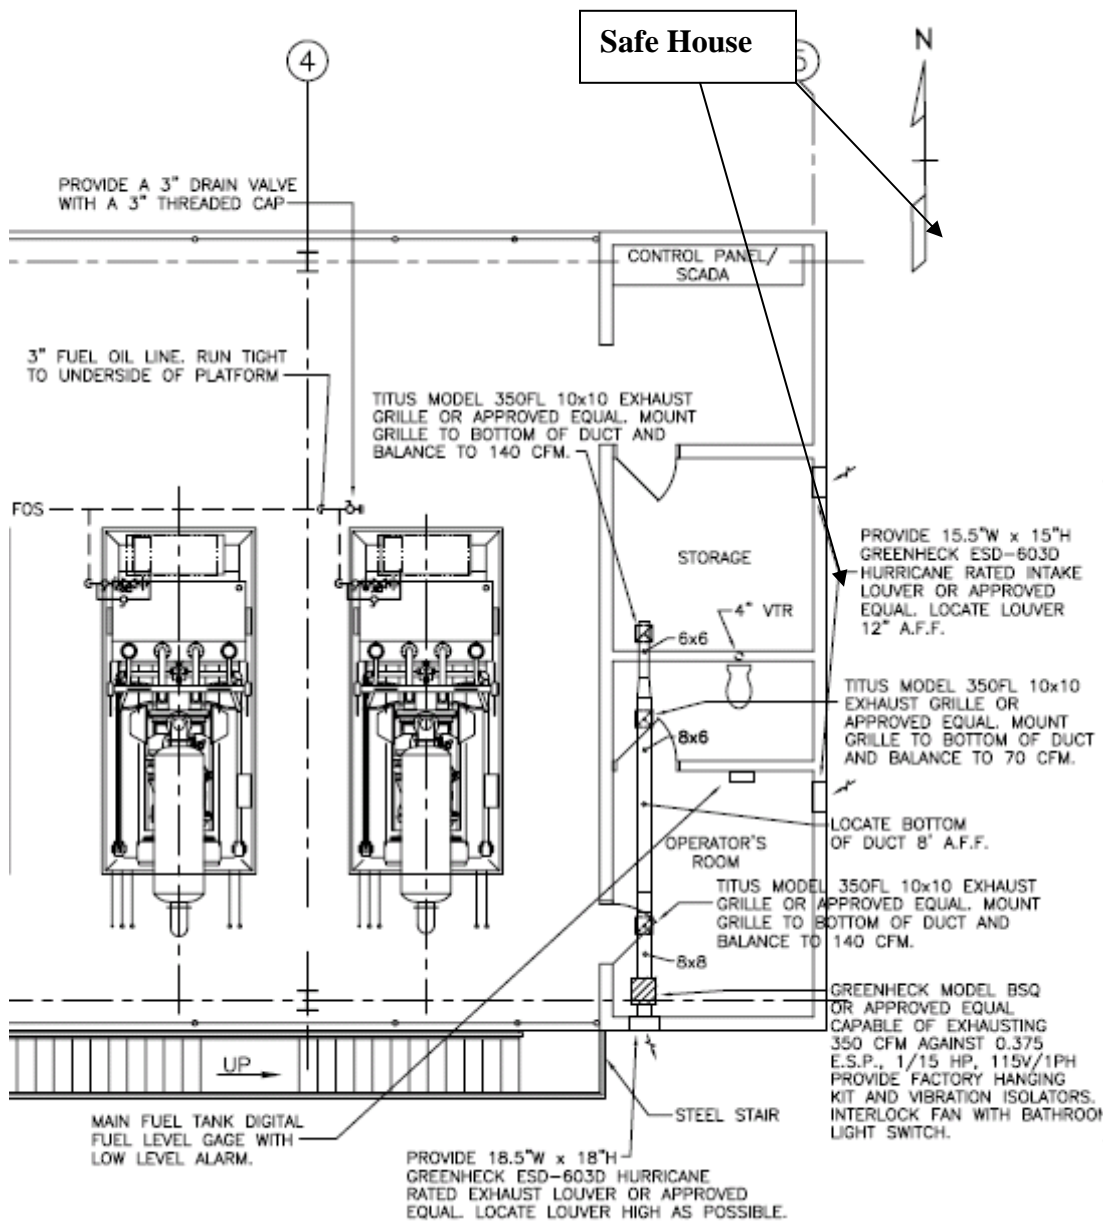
17th Street West Phase 1 Engine Platform Safe House Plan
